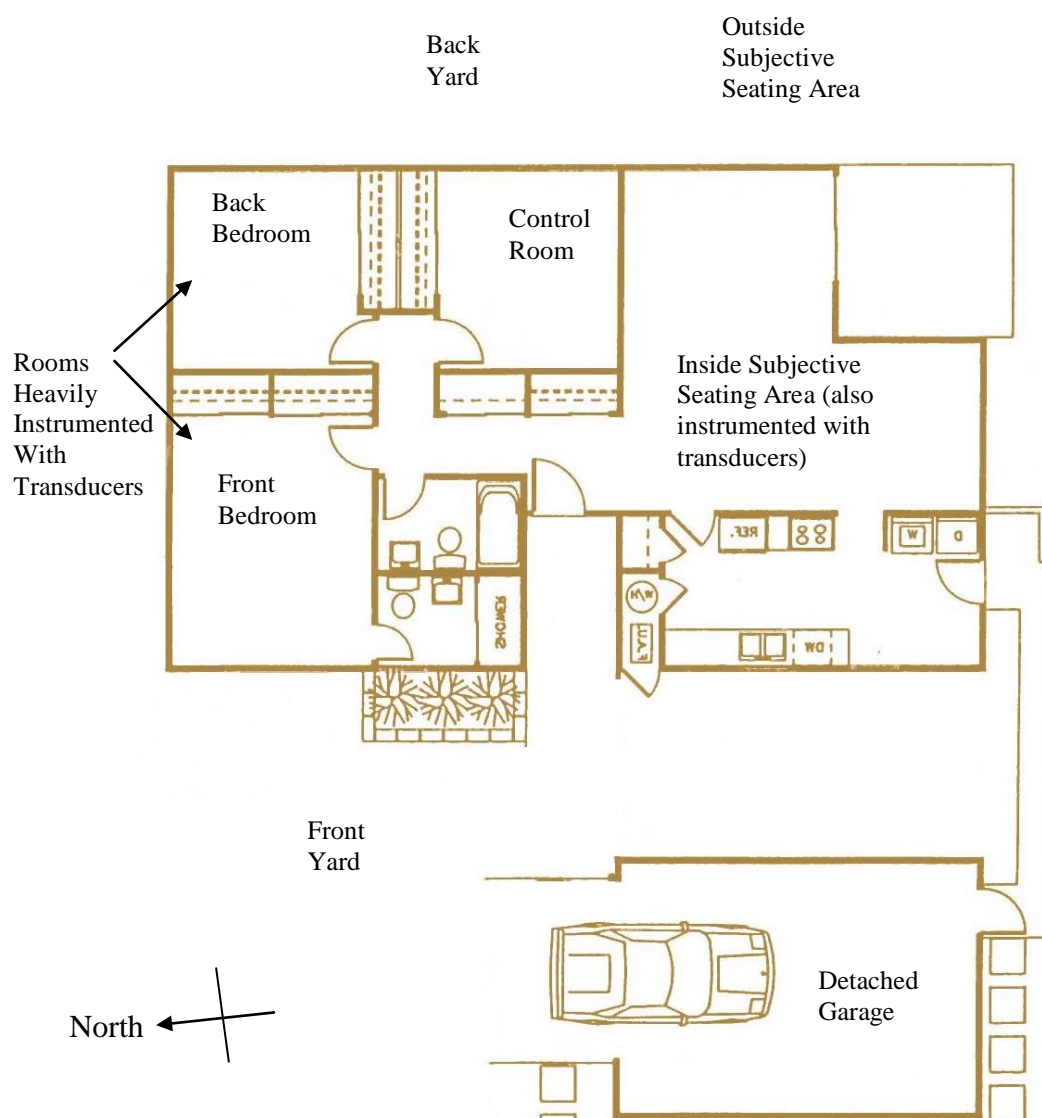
Floor plan of the house illustrating the subjective areas and the two bedrooms instrumented for structural acoustical measurements.
